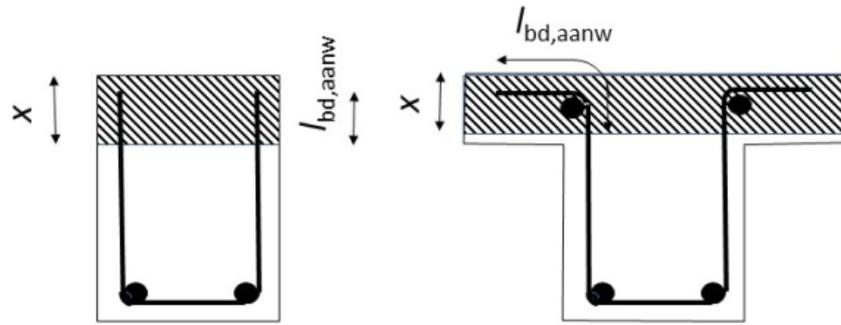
Anchorage of stirrups in the compression zone [2]
